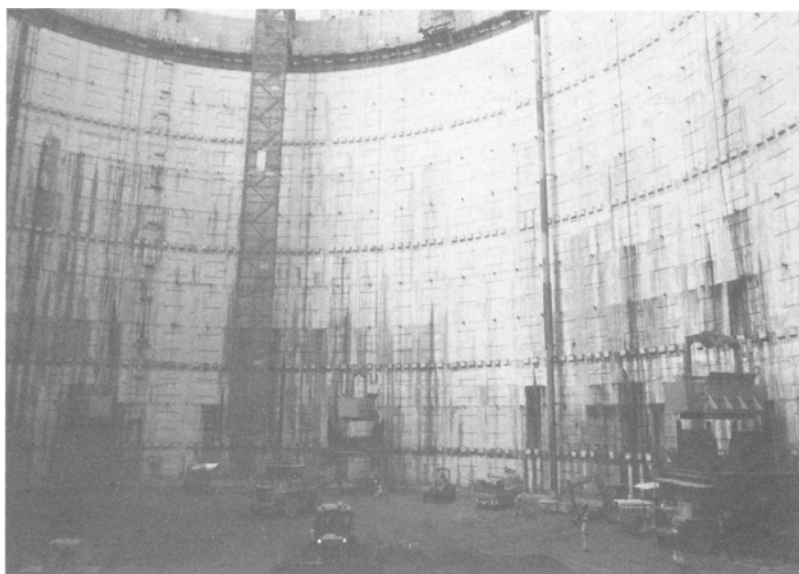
View of Completed Wall while Placing Mass Concrete in Anchorage 1A by RCC Method
